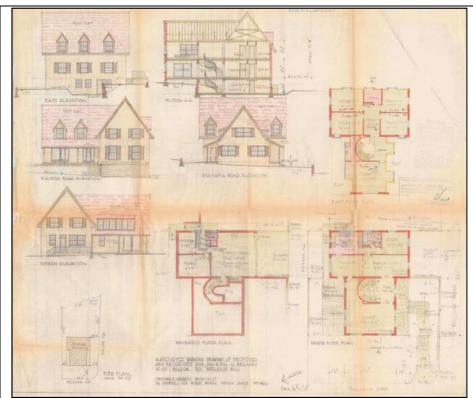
Original architectural drawings for the subject dwelling at 1 Kulgoa Road, Bellevue Hill (BA1970/340). (Source: Heritage Impact Statement by John Oultram Heritage & Design)
